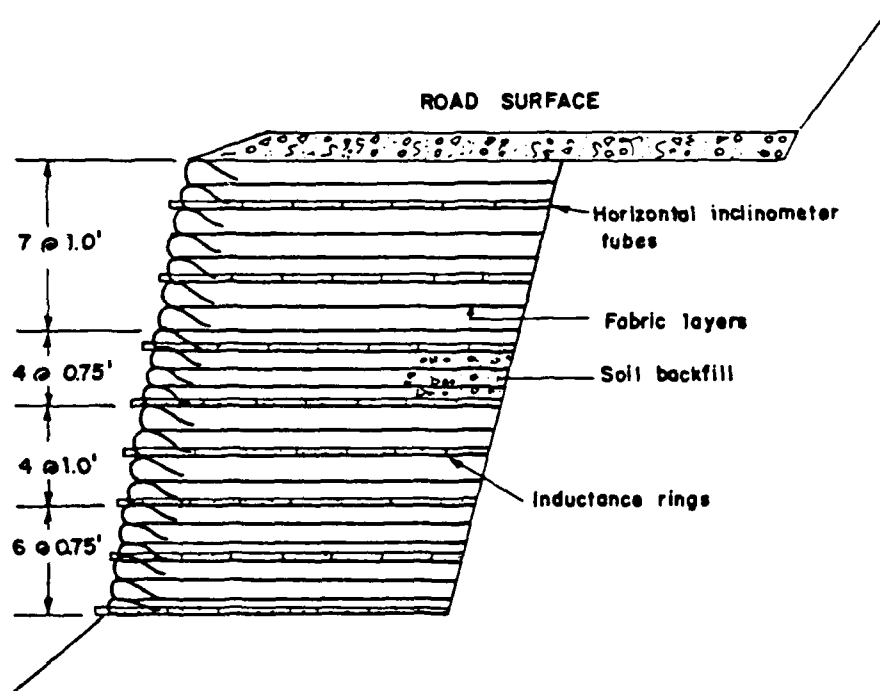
Cross-section of Olympic wall, Washington (Mohney (1977))
